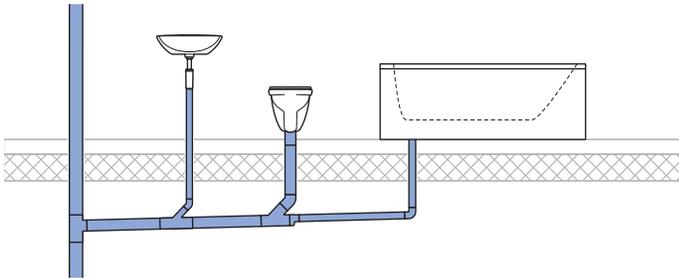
Laying the branch discharge pipe under the ceiling, single stack
